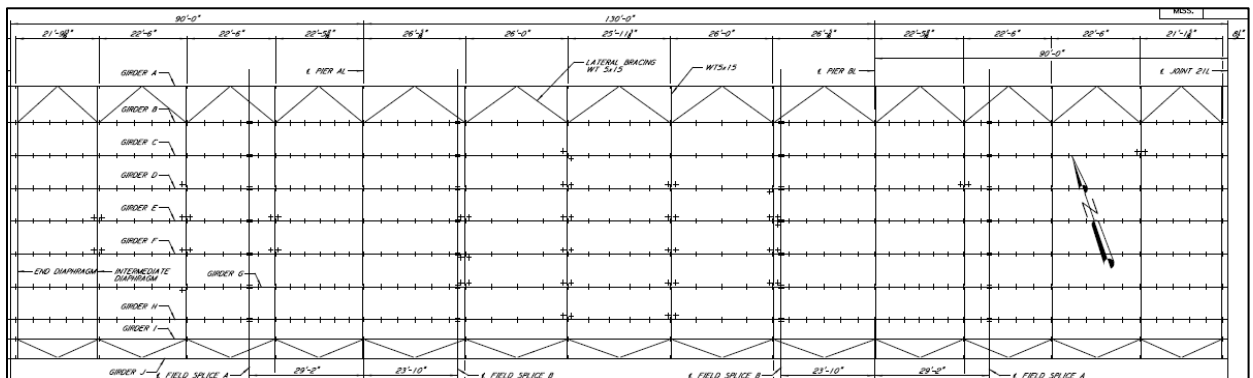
Westbound Bridge Framing Plan (Spans 20-22)
